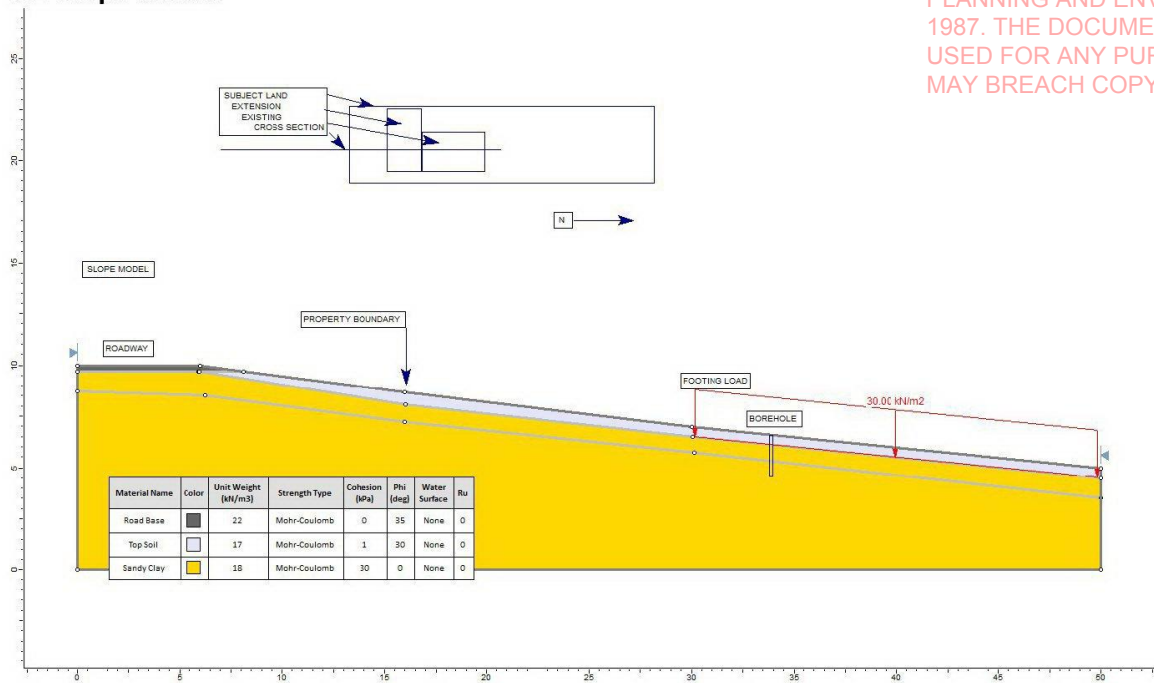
Slope model showing line of cross section, possible failure modes, (none), with proposed and existing build envelope. (Author).
